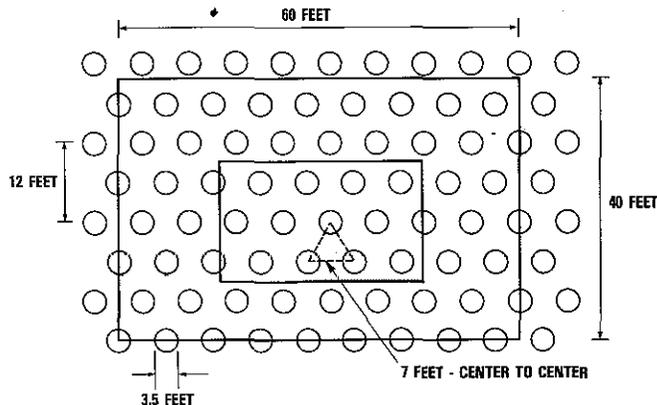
Plan View - Typical Stone Column Foundation Pattern
